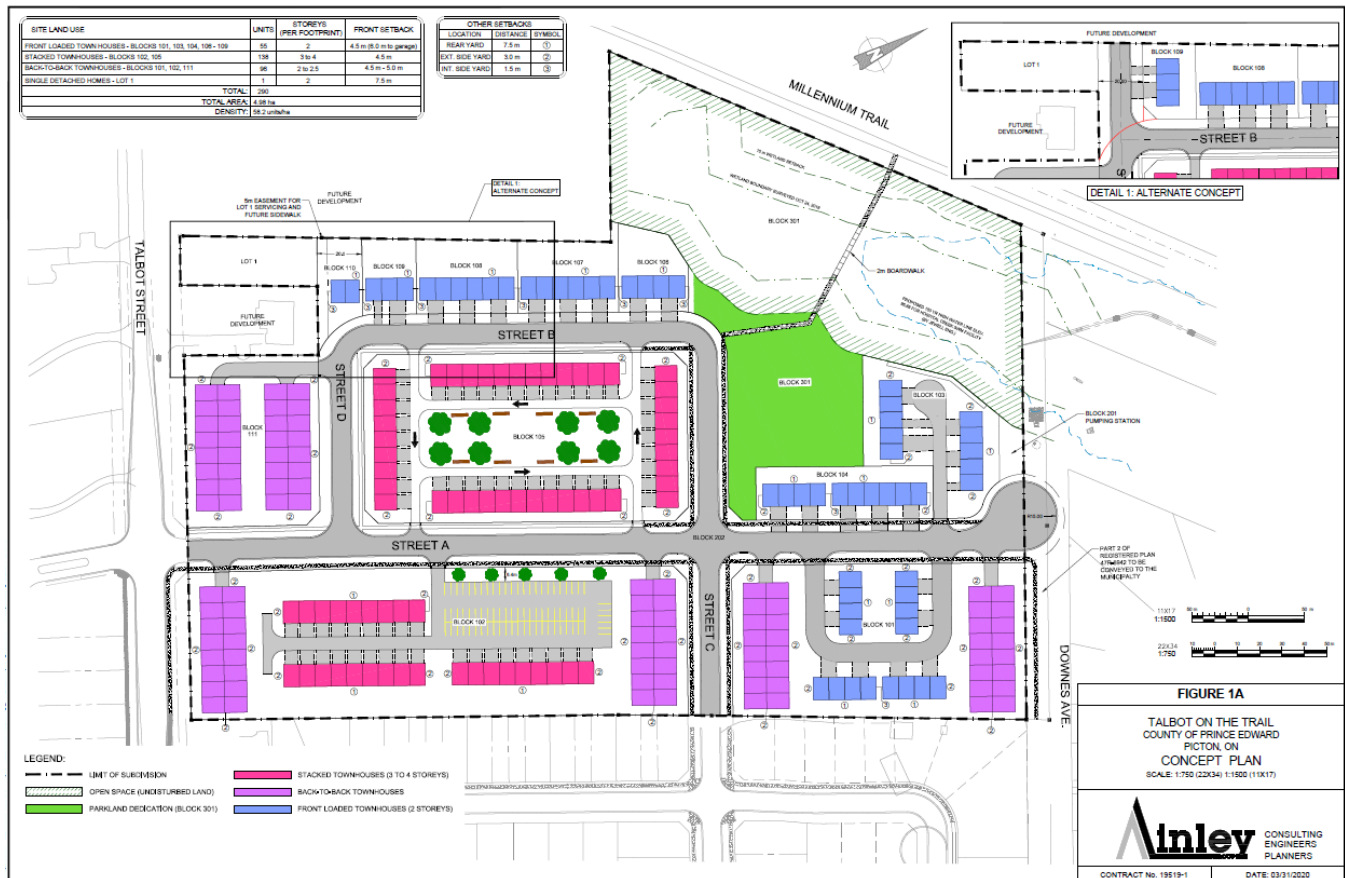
Concept Plan (Stacked townhouses shown in pink, back-to-back townhouses shown in purple, traditional townhouses shown in blue, and parkland shown in green) (Source: Ainley Group)
